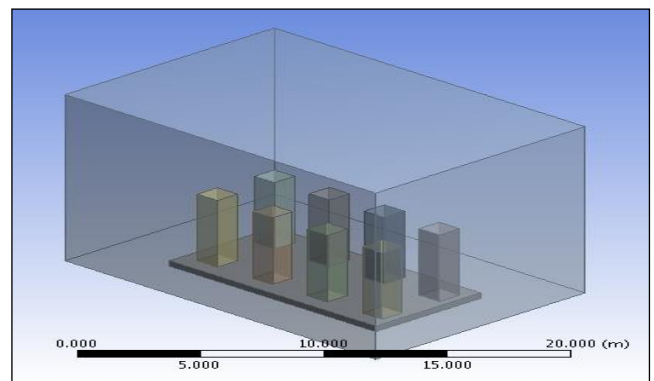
Geometrical sketch of group of rectangular piles having 3d spacing
